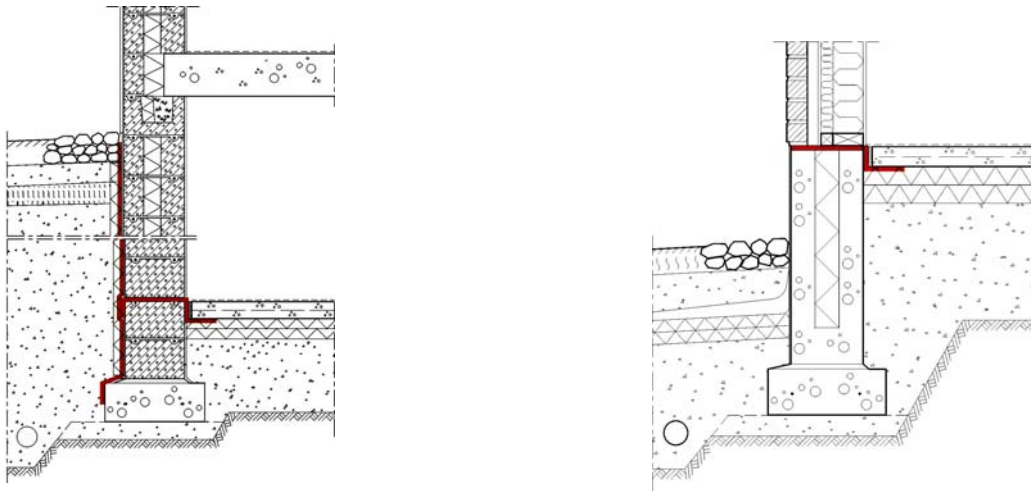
On the left, the joint of the floor slab and concrete foundation wall is sealed with bitumen felt, marked with thick grey line. On the right, a light weight concrete wall is plastered on parts backing soil (both outside and inside, under the floor slab), to stop soil air entry. Bitumen felt, marked with thick grey line, is installed on outside parts backing soil, and to the joint of the floor slab and the foundation wall. In both cases, bitumen felt is installed directly towards the concrete cast floor slab. Figs. from RT 81–1079 (2003) /2/.
